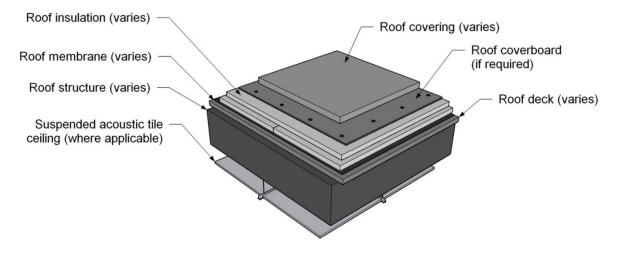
Typical Assembly Layers for Roof Enclosures
